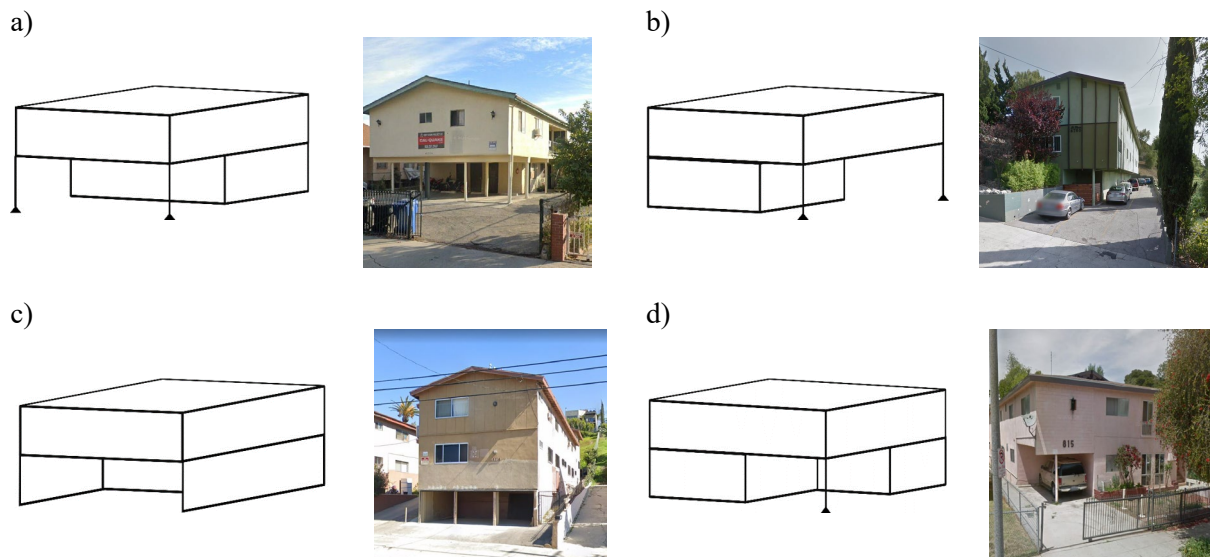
Schematic models for first-story wall layouts and their examples within Los Angeles SWOF woodframe buildings inventory for type a) L1, b) L2, c) L3, and d) L4
